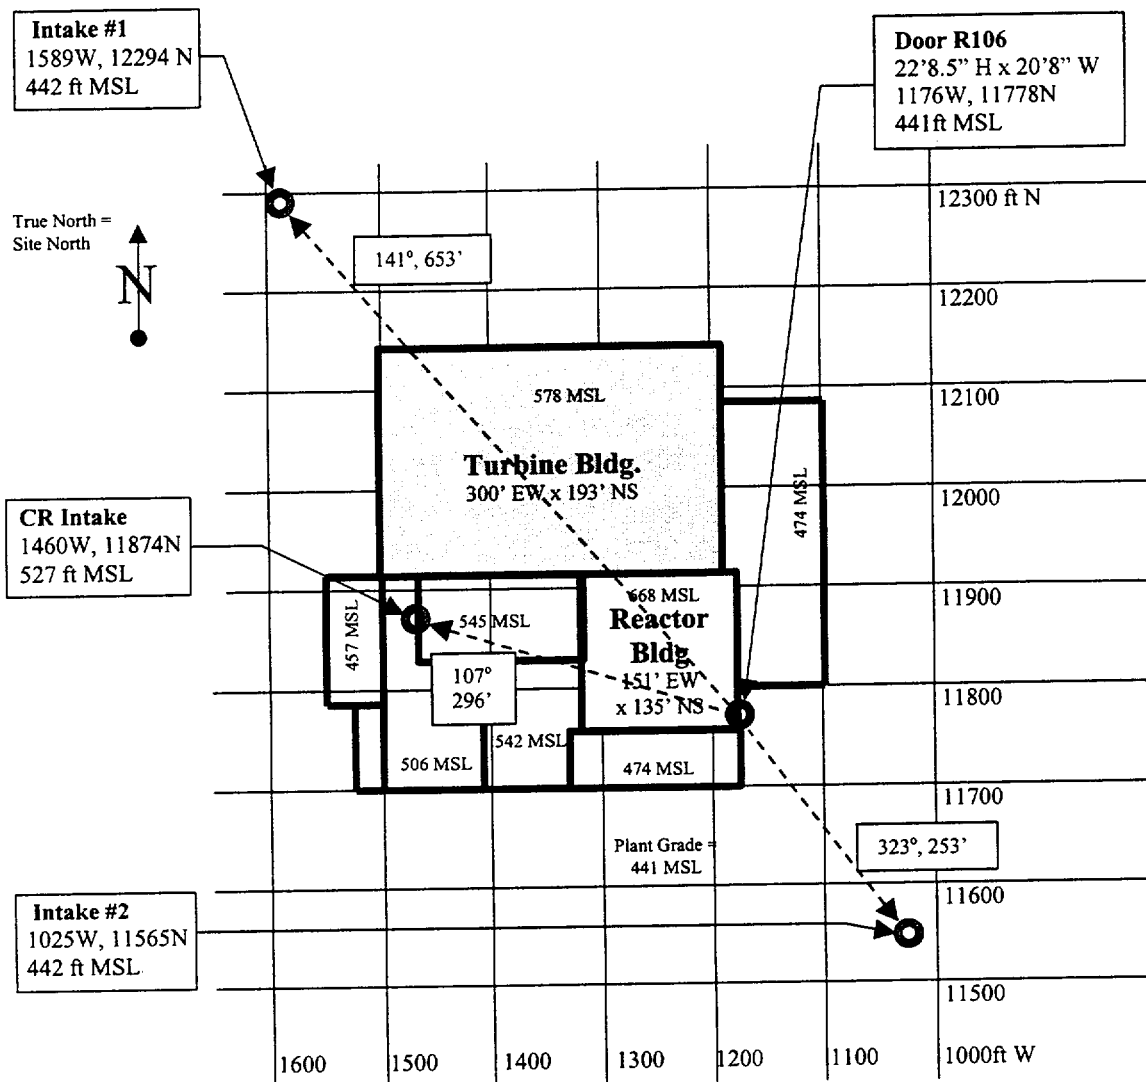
Schematic Layout of Diffuse Release from Reactor Building Door R106 (Railroad/Truck Bay Access)
